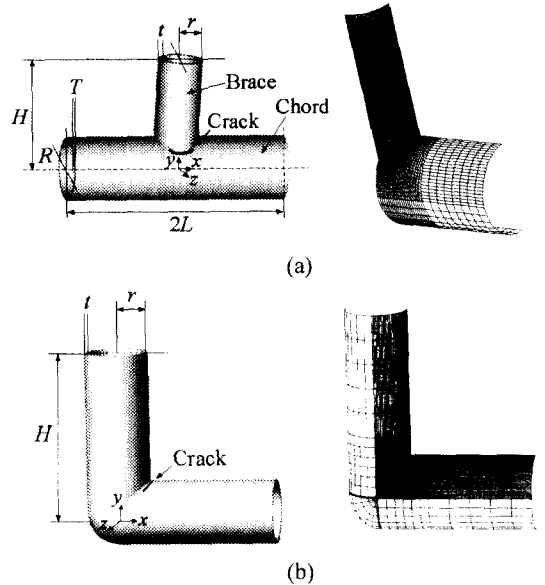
Geometry and FE model & location of surface crack of welded (a) T-joint and (b) L-joint
